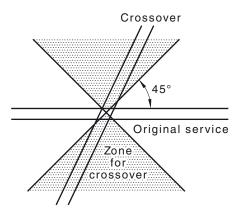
CROSSOVER ZONE FOR ELECTRICAL CABLES AND GAS PIPES
